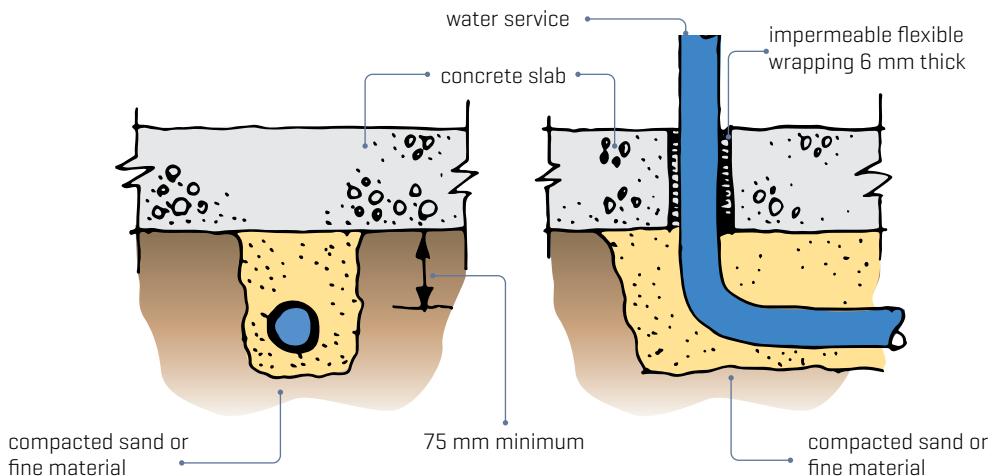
Water services under concrete slabs – pipes under slabs should be ducted or sleeved to allow for detection of leaks and for repair and replacement.
